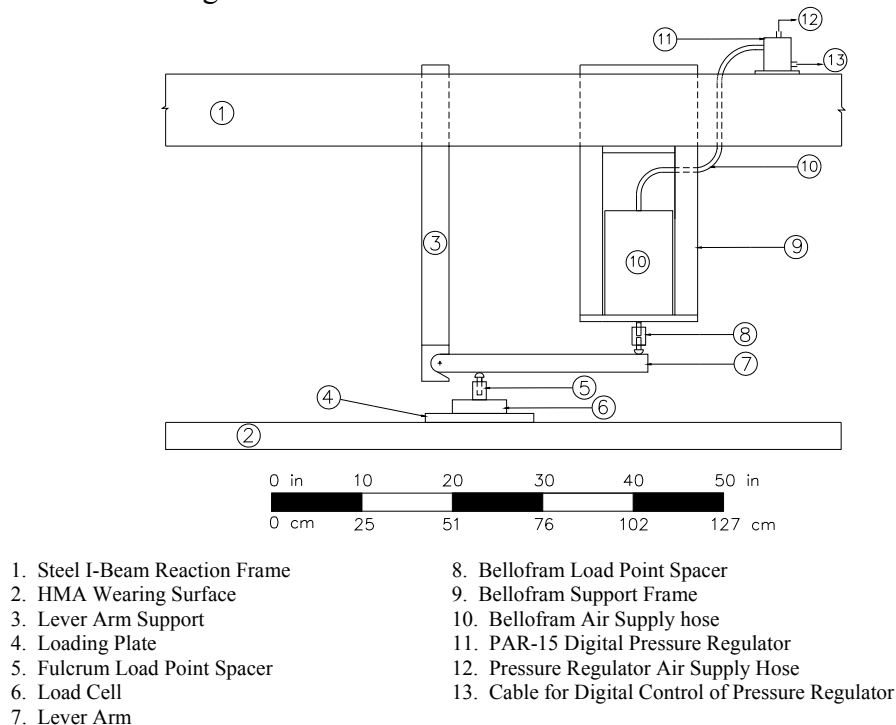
Diagram of modified pavement loading system used for TS 2 through TS 18.
